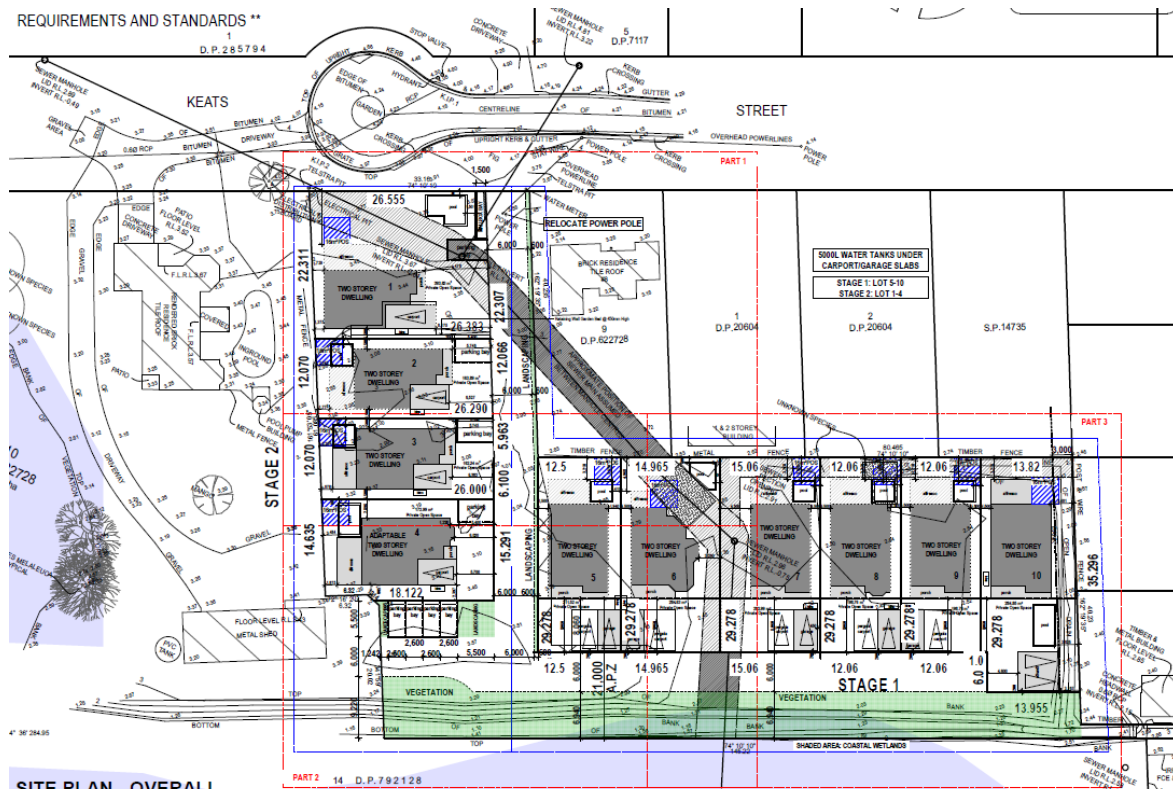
Site plan showing location and layout of proposed dwellings, swimming pools and associated infrastructure and landscaping.
